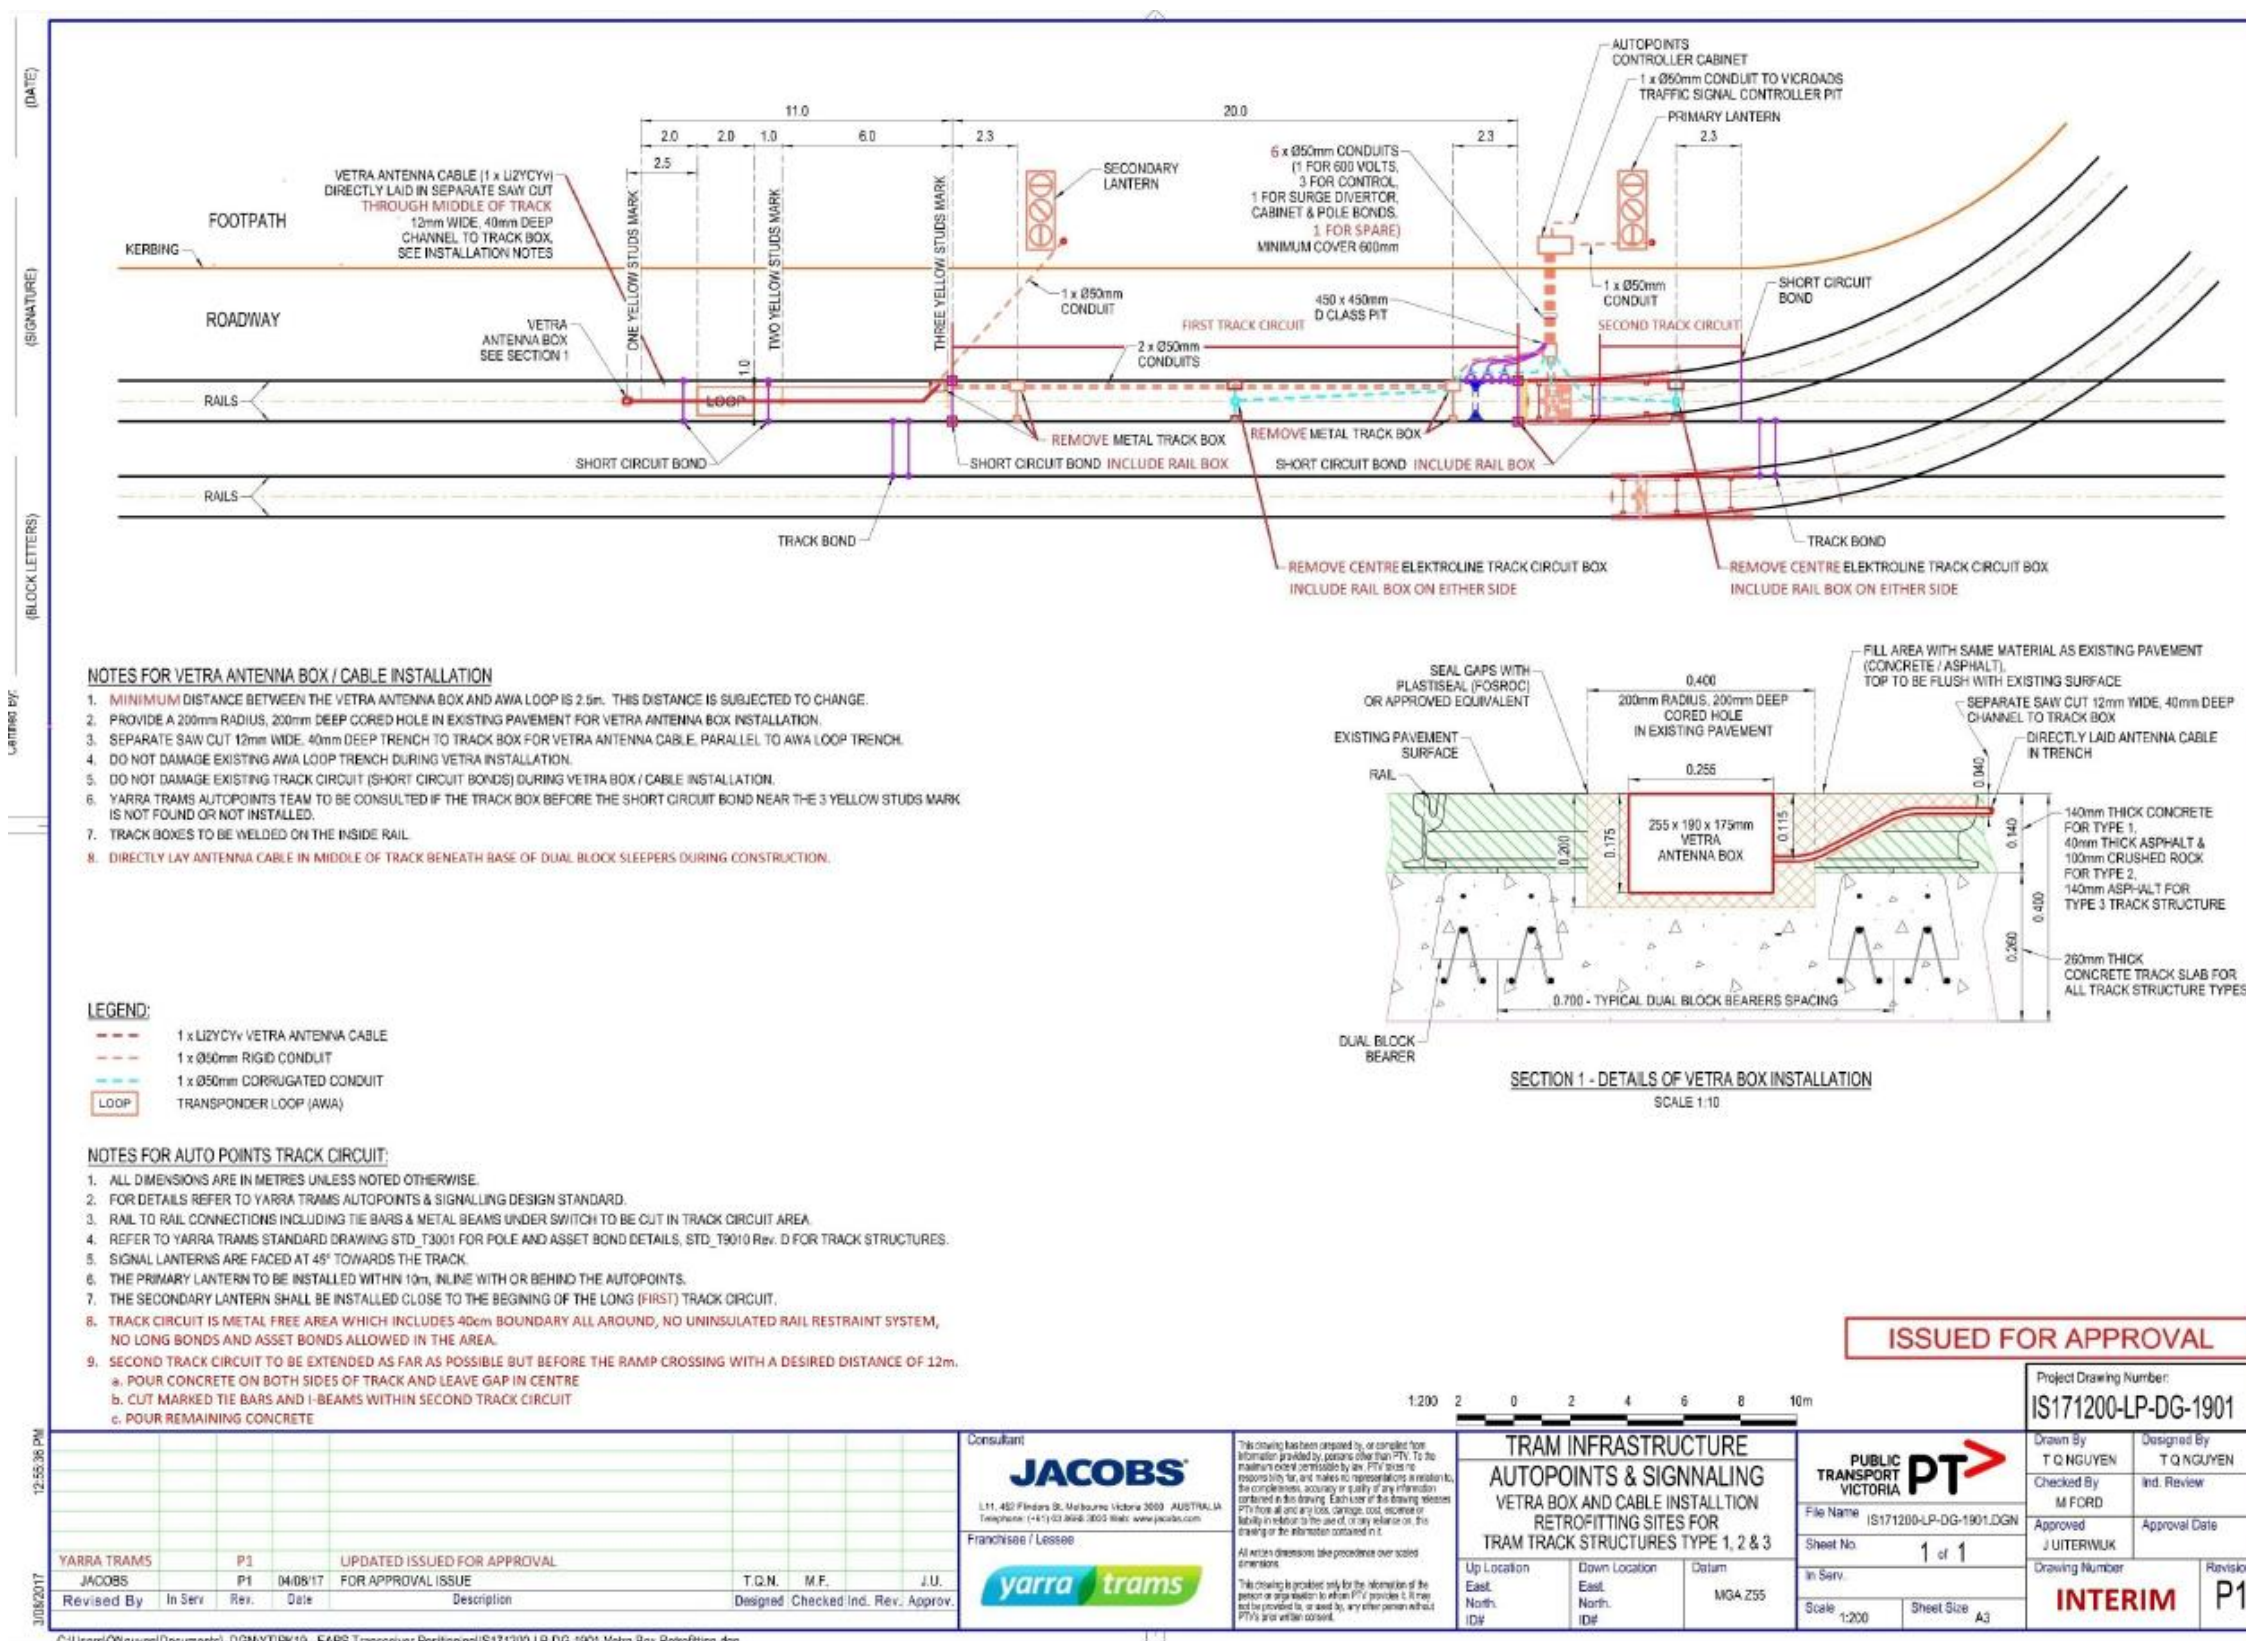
Auto Point Signalling Vetra Box and Cable Installation
